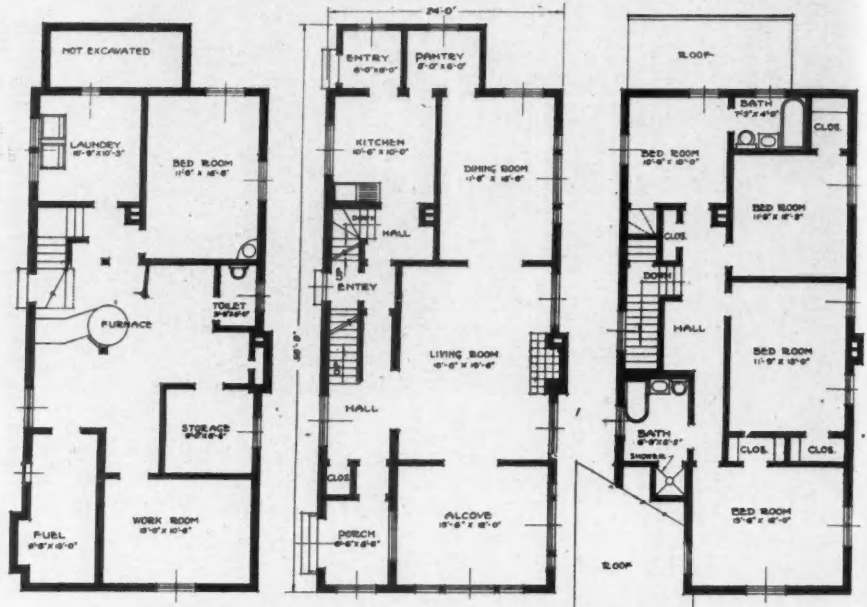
Floor Plans of Concrete Block House Described in the Accompanying Article, Designed by Dean & Dean, Architects, Chicago.
